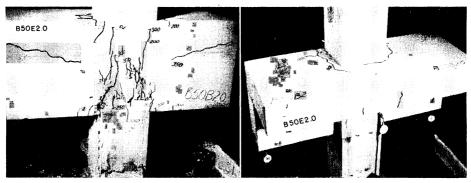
Typical cracking for edge column specimens, Type E (beam series)
